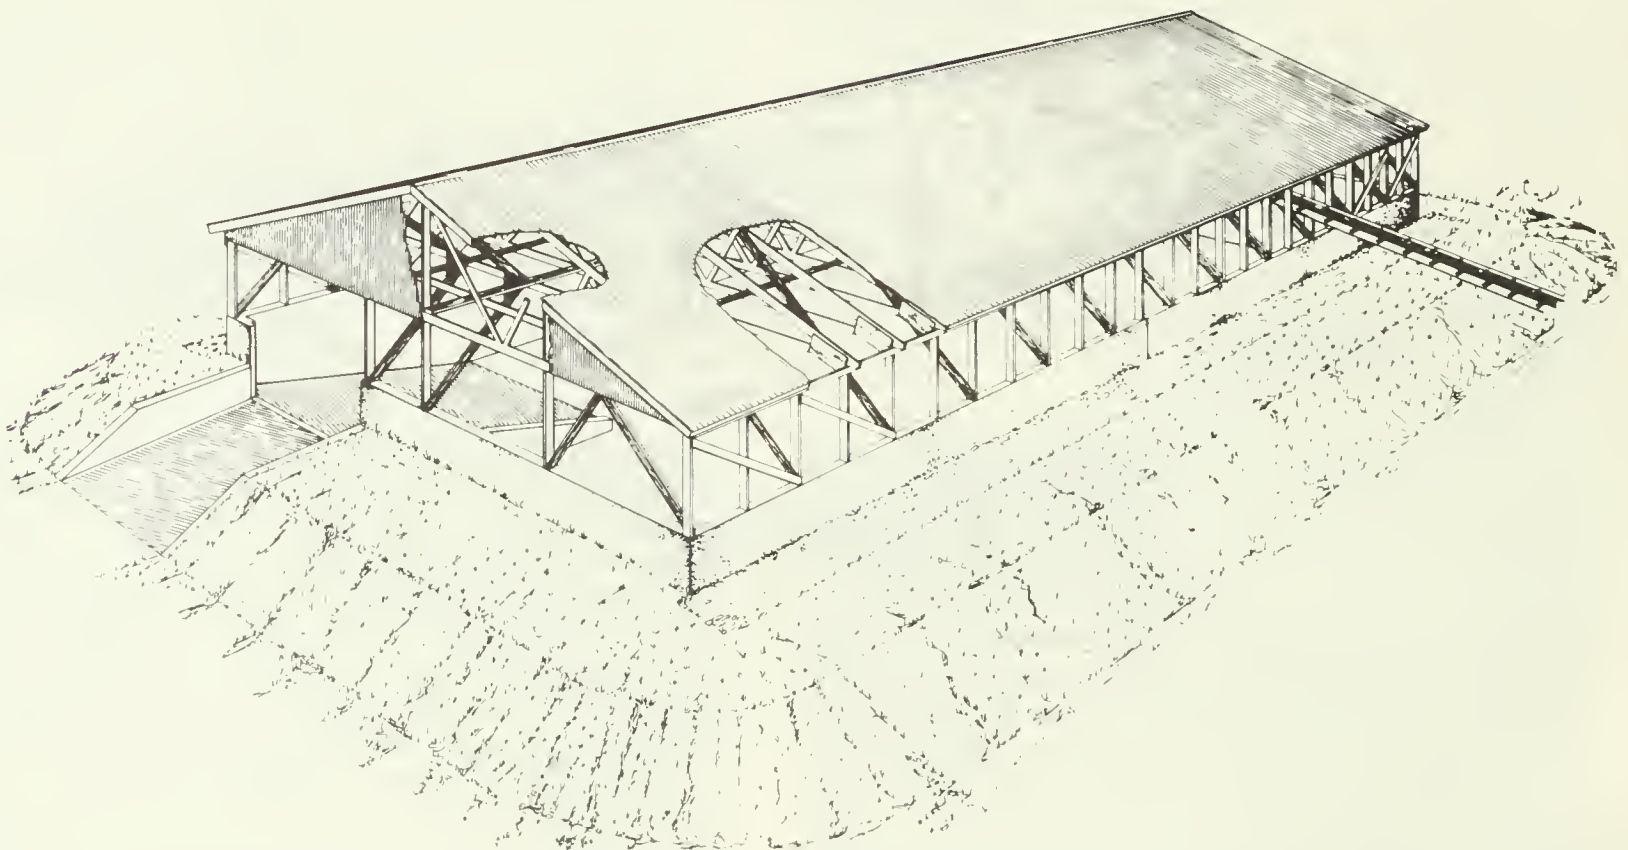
Rectangular roofed storage for semisolid manure (CPS plan M-2705)
